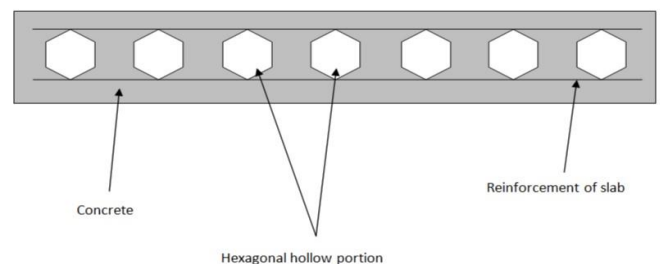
Cross Sectional representation of hollow deck slab with hexagonal reinforcement.
